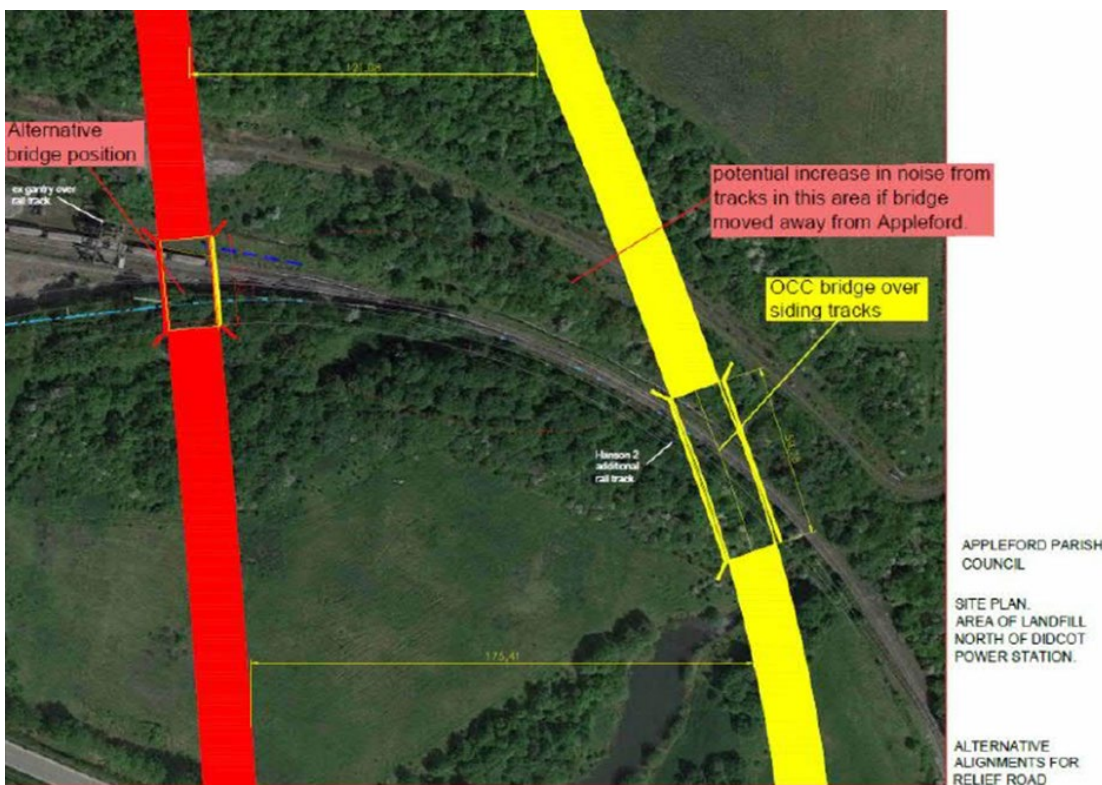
Amended APC alignment – bridge crossing over the Appleford sidings
